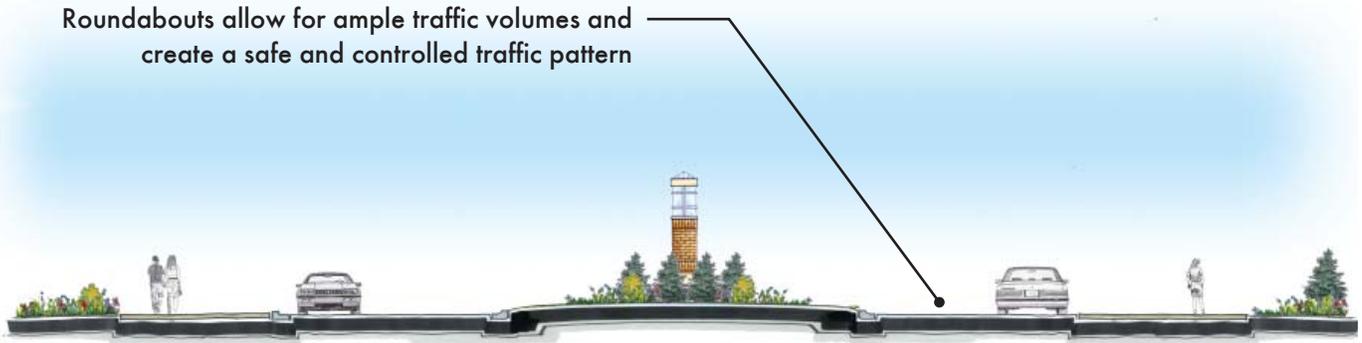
Typical corridor cross section utilizing roundabout intersections to promote access management.
